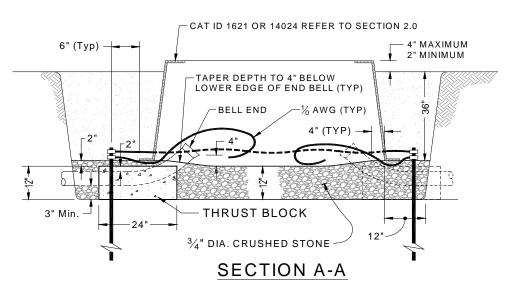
Typical Fiberglass box Pad Installation Details to support 15kV PME-9 Switches
